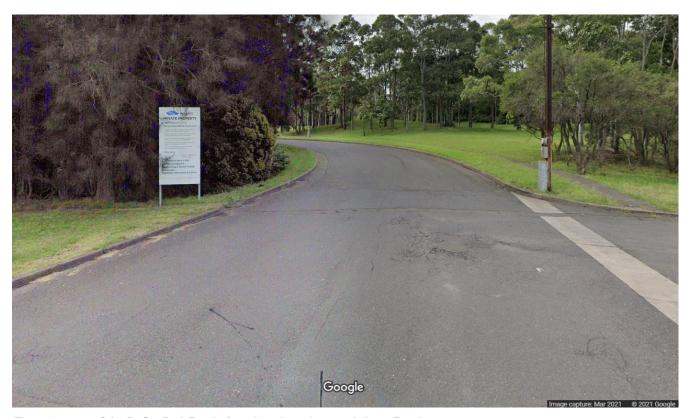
Cringila Car Park Road, viewed northwards towards Loop Road
